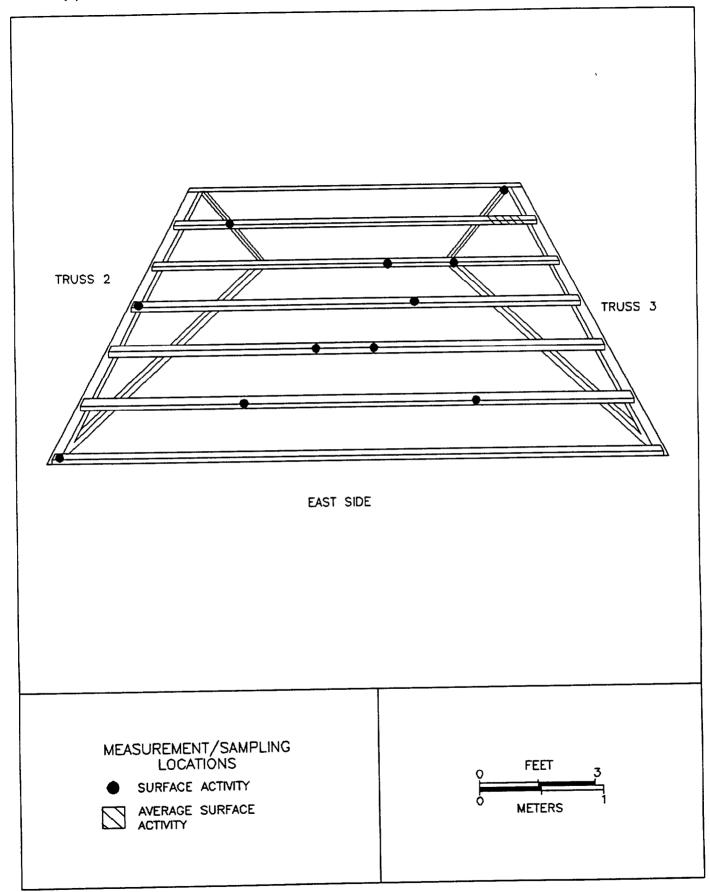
Building 3, Bay 2, East — Measurement and Sampling Locations
